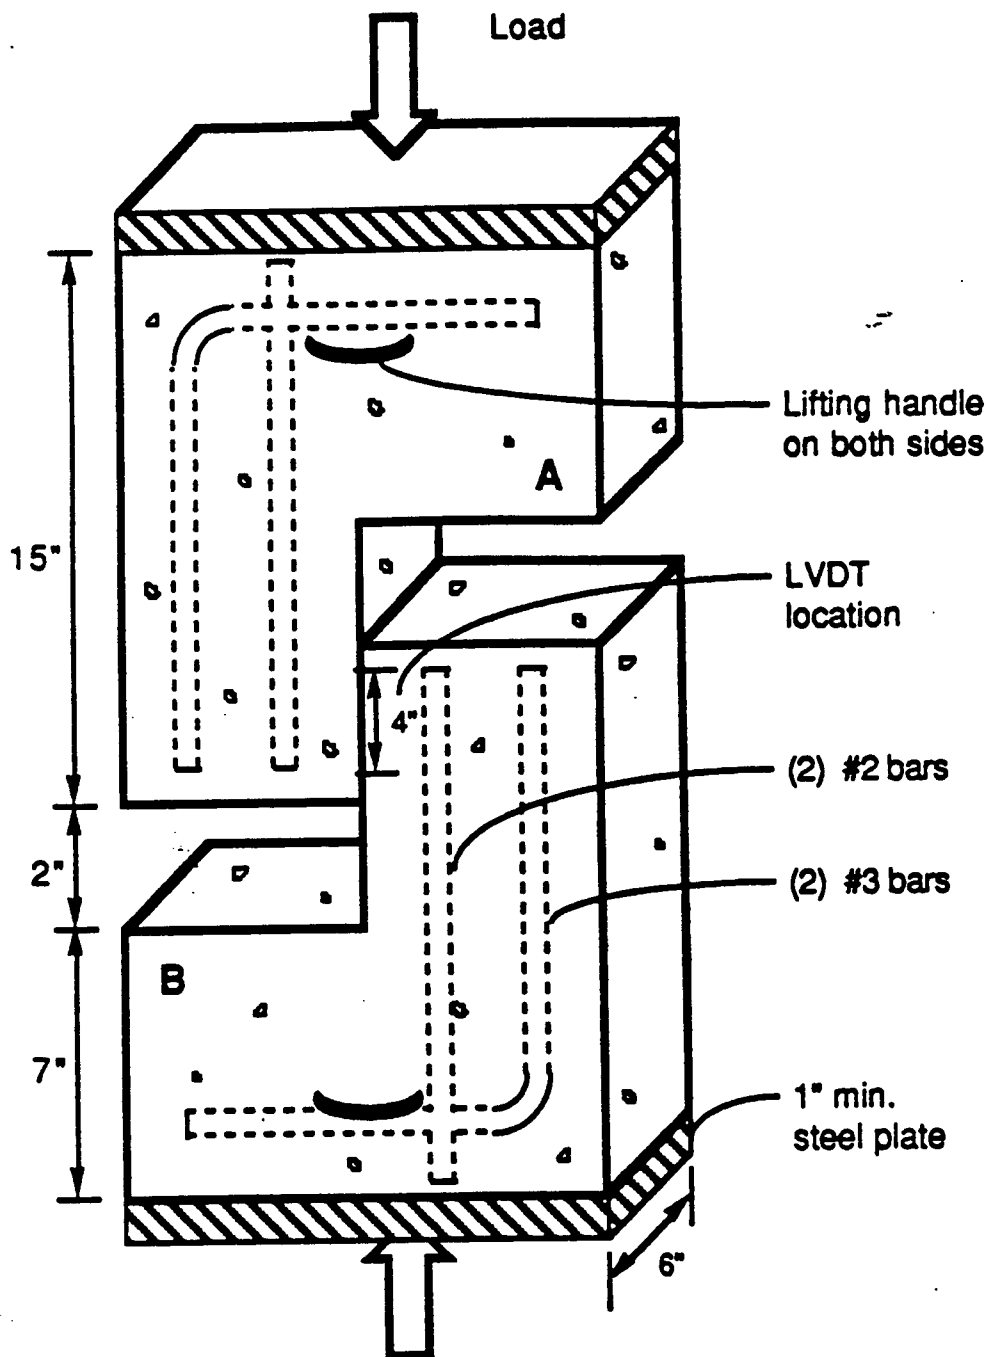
Dimensions and Steel Layout for the Double L Bond Specimen [12]
